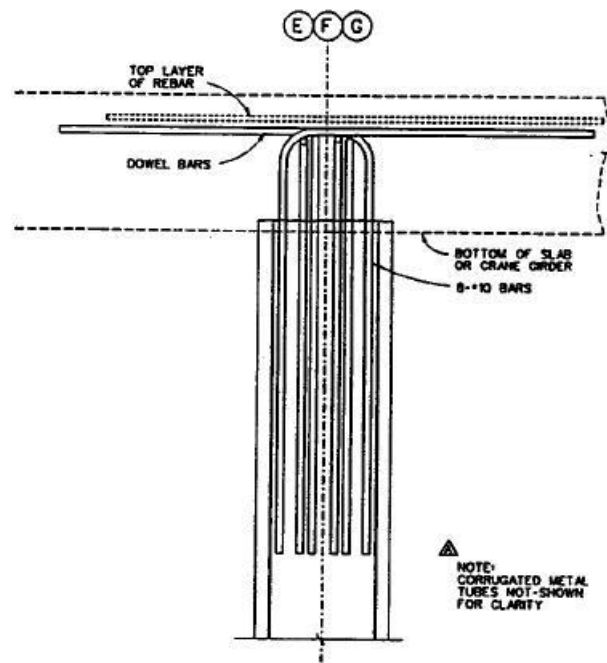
Typical prestressed concrete pile moment connections with inward bent dowel (Roder, 2002)
